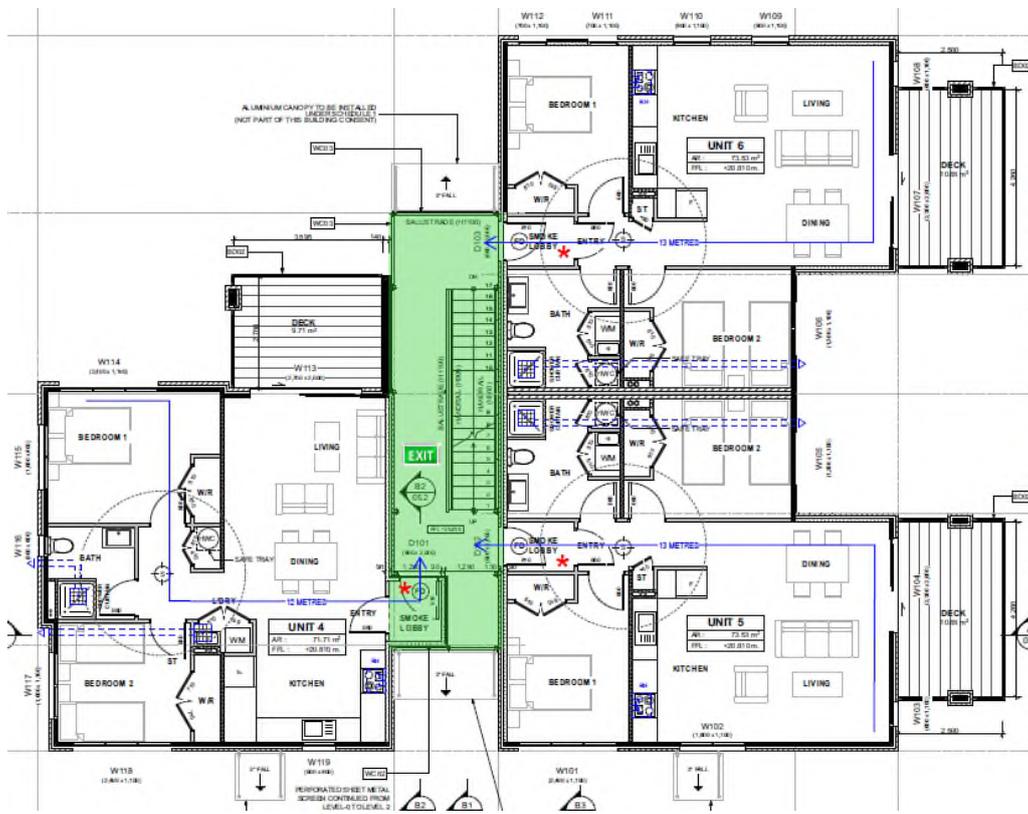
First floor plan showing escape routes and smoke lobbies (not to scale)
